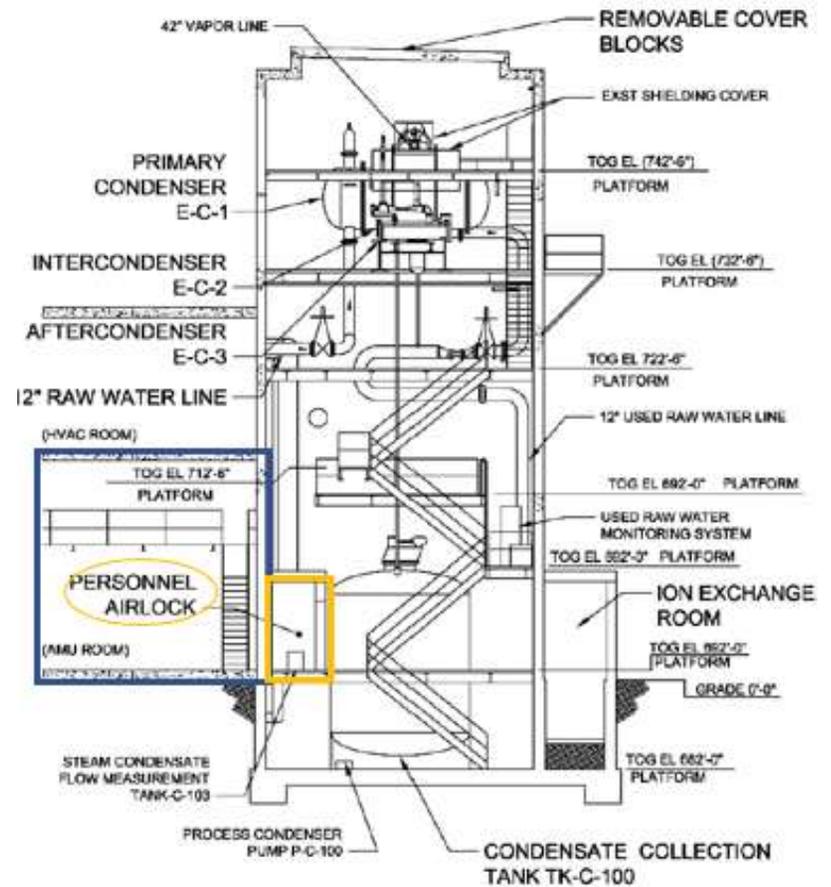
242A Evaporator Facility Condenser Room (East Elevation).
